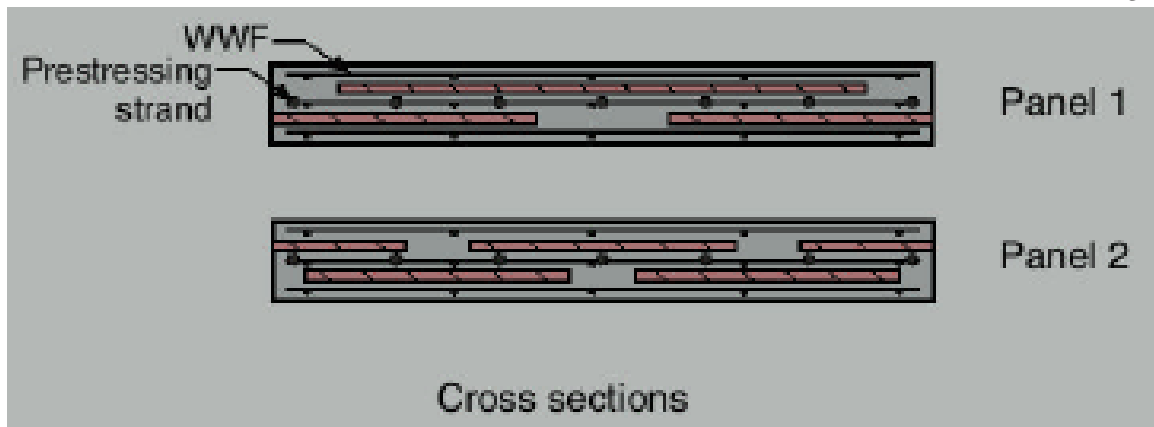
Cross sectional view of the two panels tested by Lee and Pessiki (2008)
